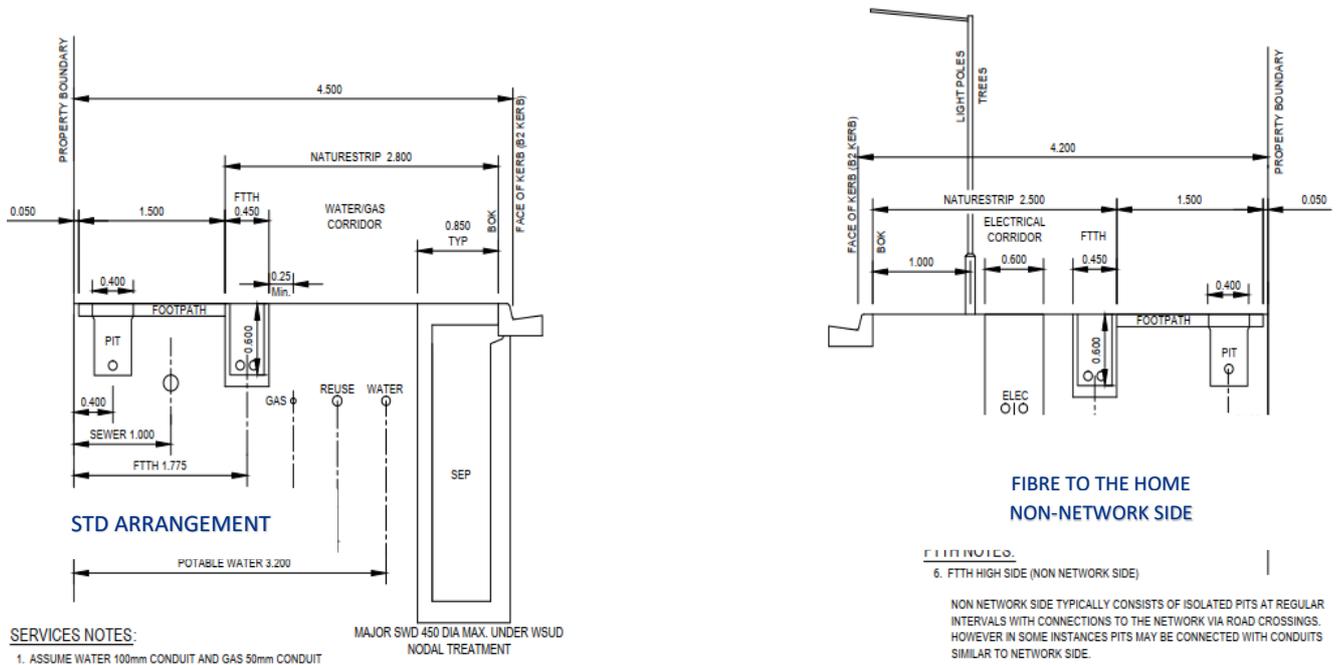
EDCM Service Locations – Cross Sections for Access Street Appendix D – Figure 003 (Sections Not To Scale)
